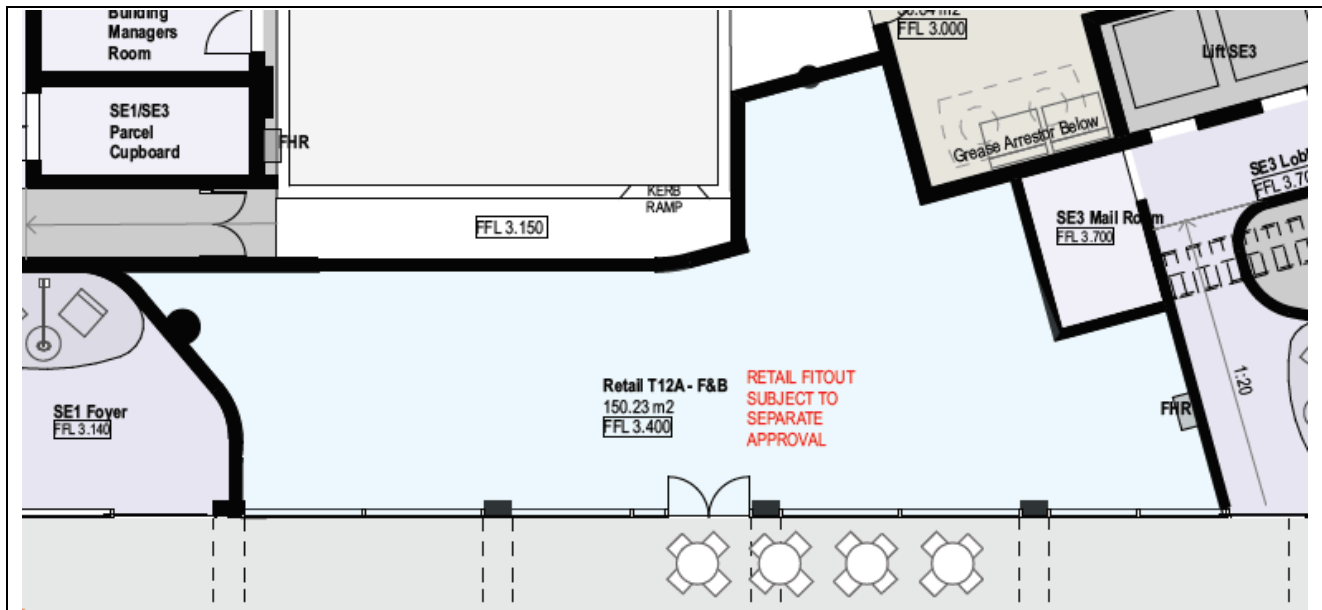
Approved retail area 12A (shaded light blue). Source: SSD 6633 approved plans
